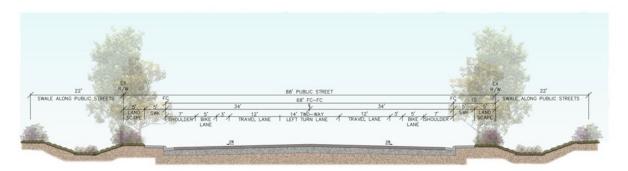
Internal Backbone and Interior Local Streets Extension of Burton Avenue and Dayton Street to Street "A" (Morgan Street) and Possible Additional Public Streets (no parking allowed) Modified 4/1/2024
